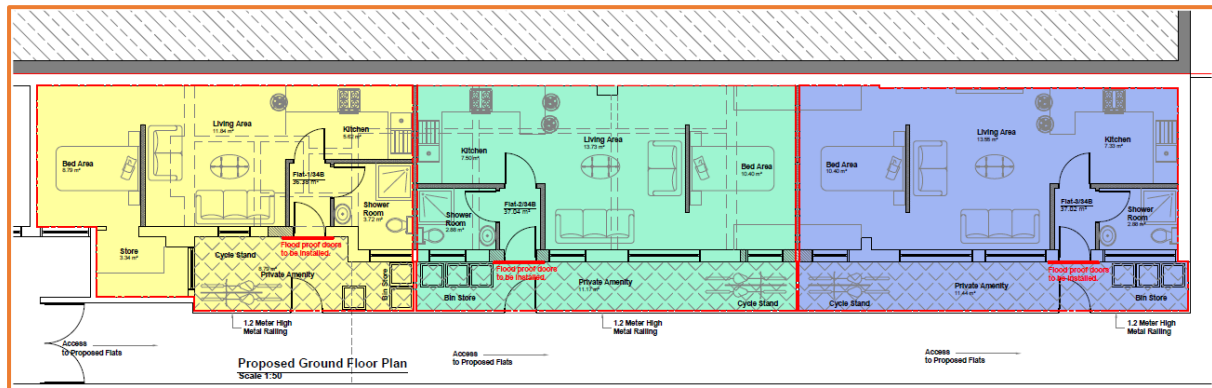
Proposed Ground Floor Plan (Source: Multi Creation)
